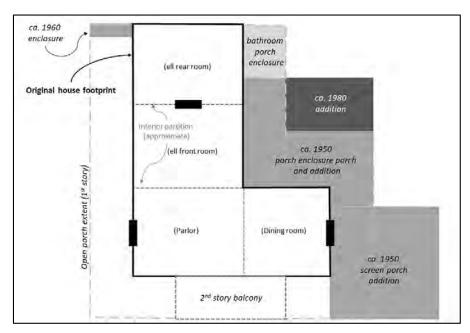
Jesse Trader House – first floor composite plan view. Not to scale.
